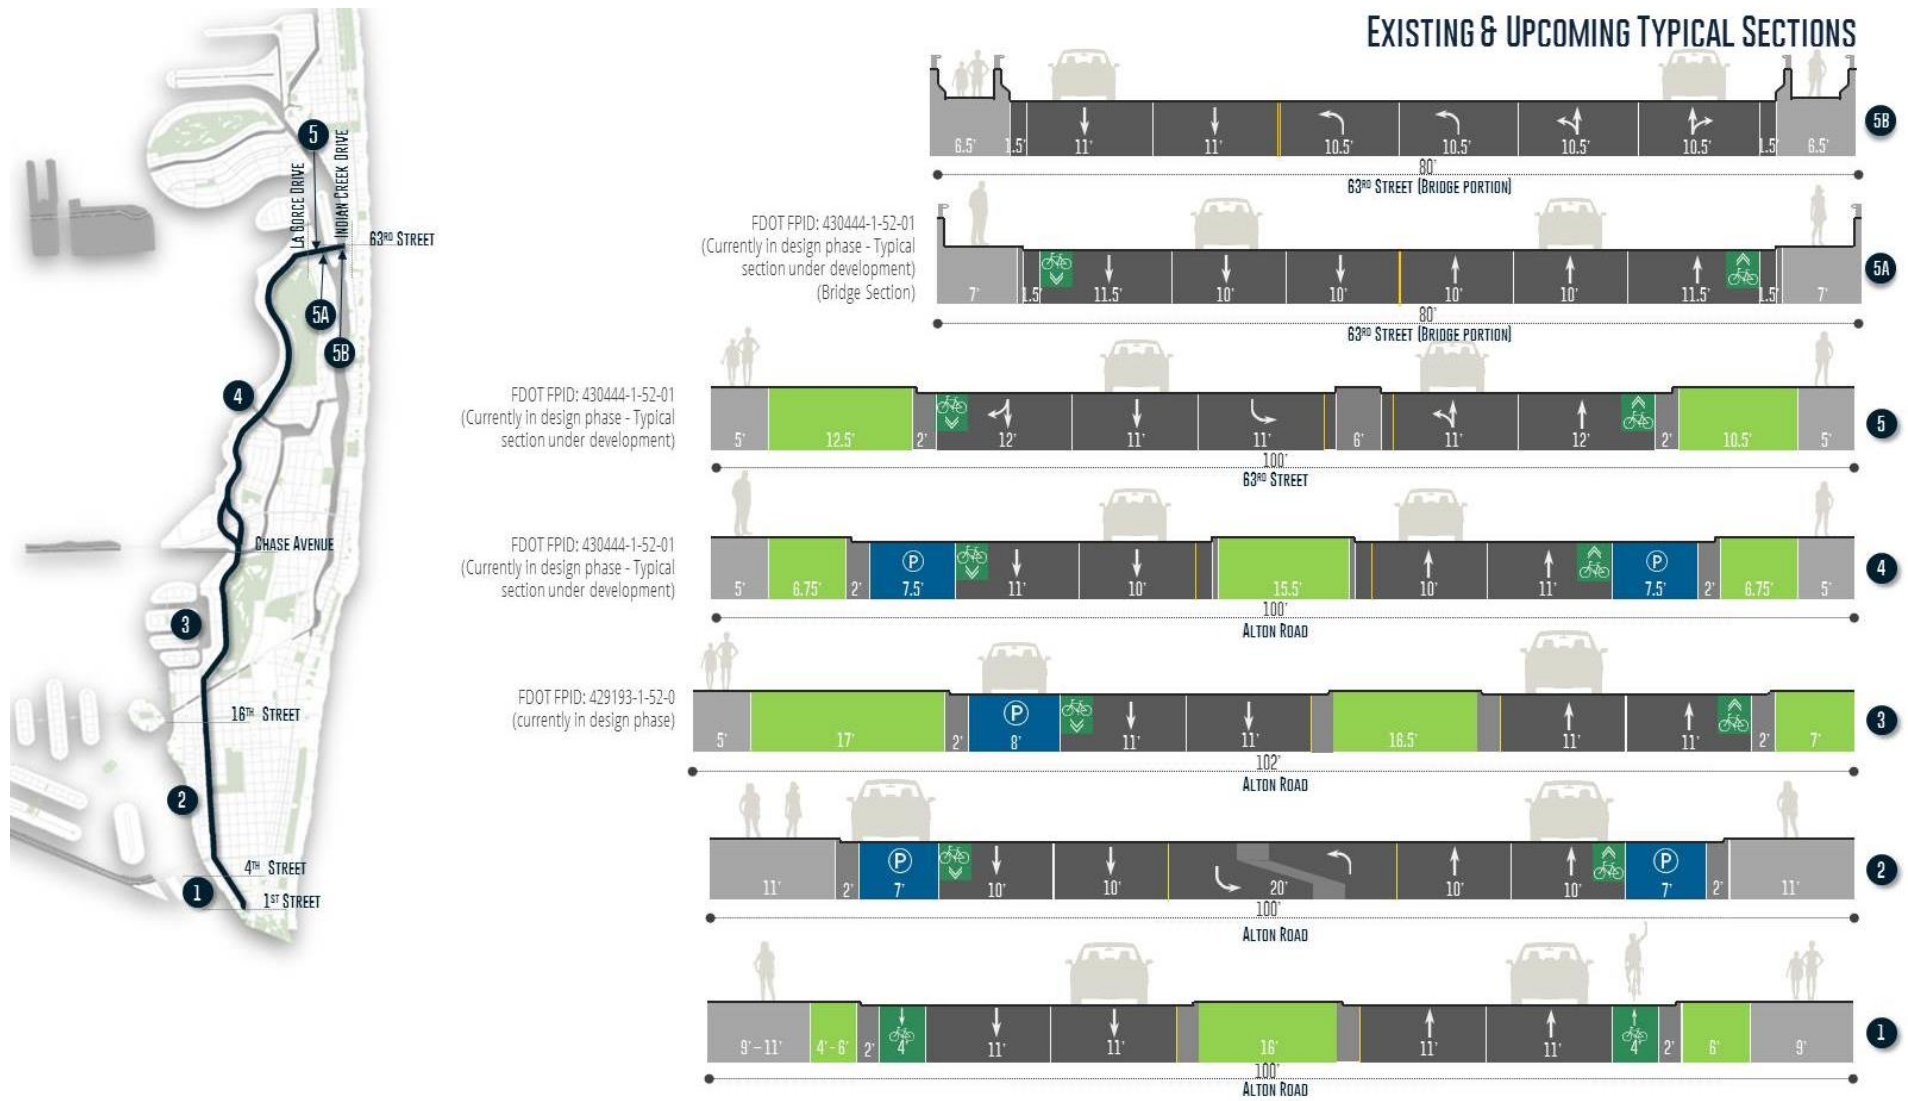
SR 907/Alton Road – 63rd Street Corridor Segments and Existing Typical Sections
